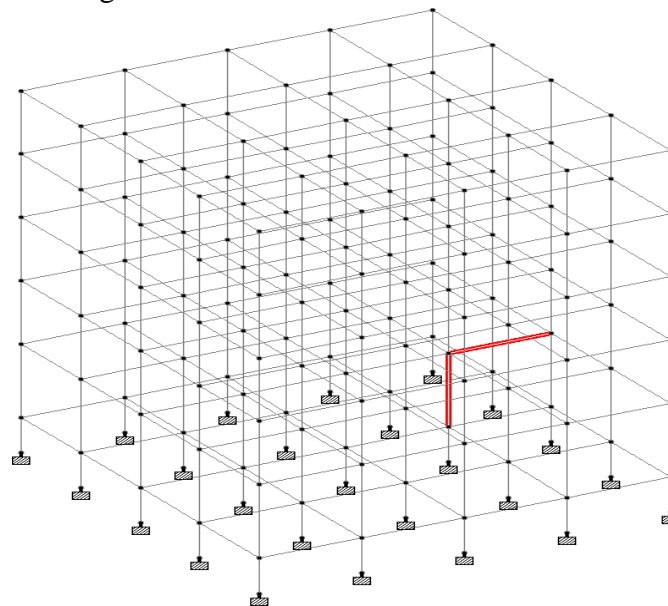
3-d view of the G+4 building model, highlighted members indicate the ones which have been considered for detailing
